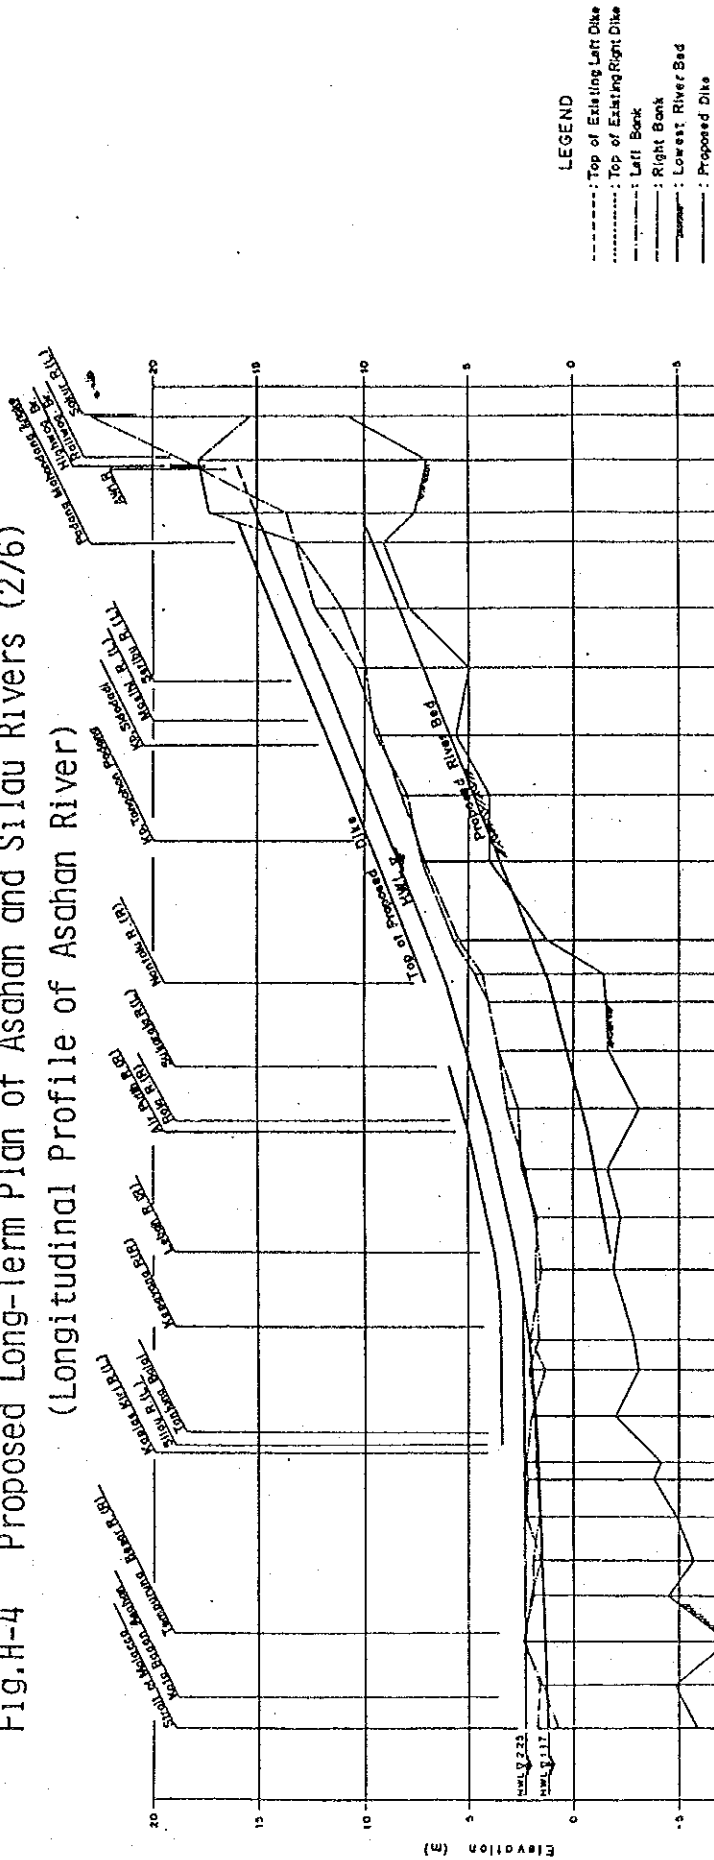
Proposed Long-Term Plan of Asahan and Silau Rivers (2/6)
